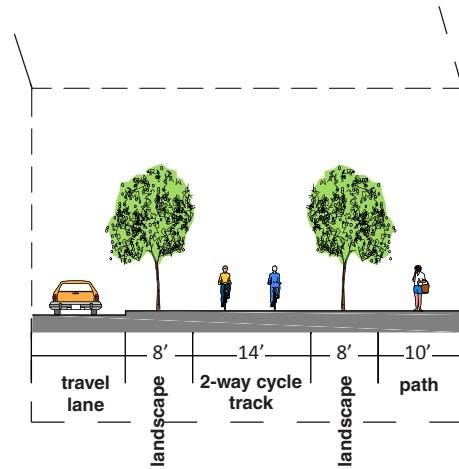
Two-Sided Trail Parkway Street Section - Option 2: Walking and Cycle Facilities
